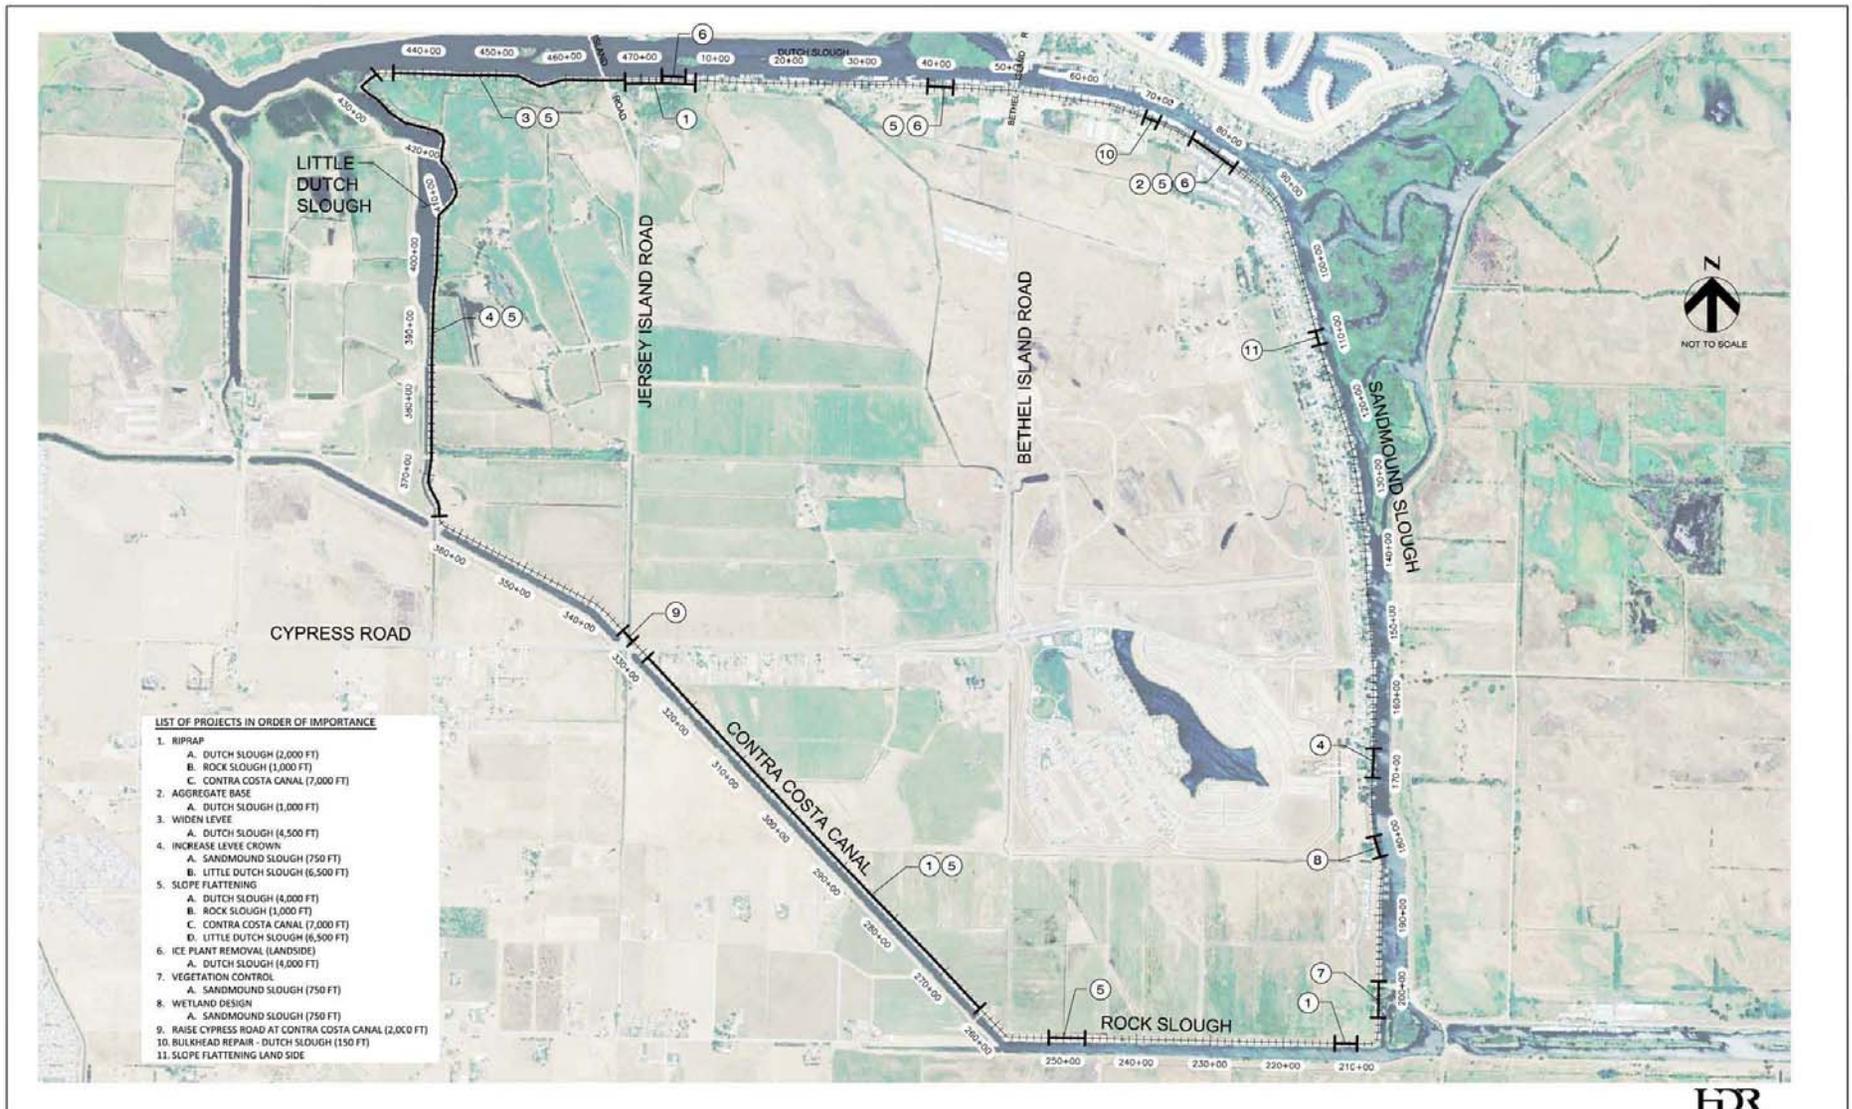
RECLAMATION DISTRICT 799 (HOTCHKISS TRACT) DESIGN AND CONSTRUCTION PROJECTS
